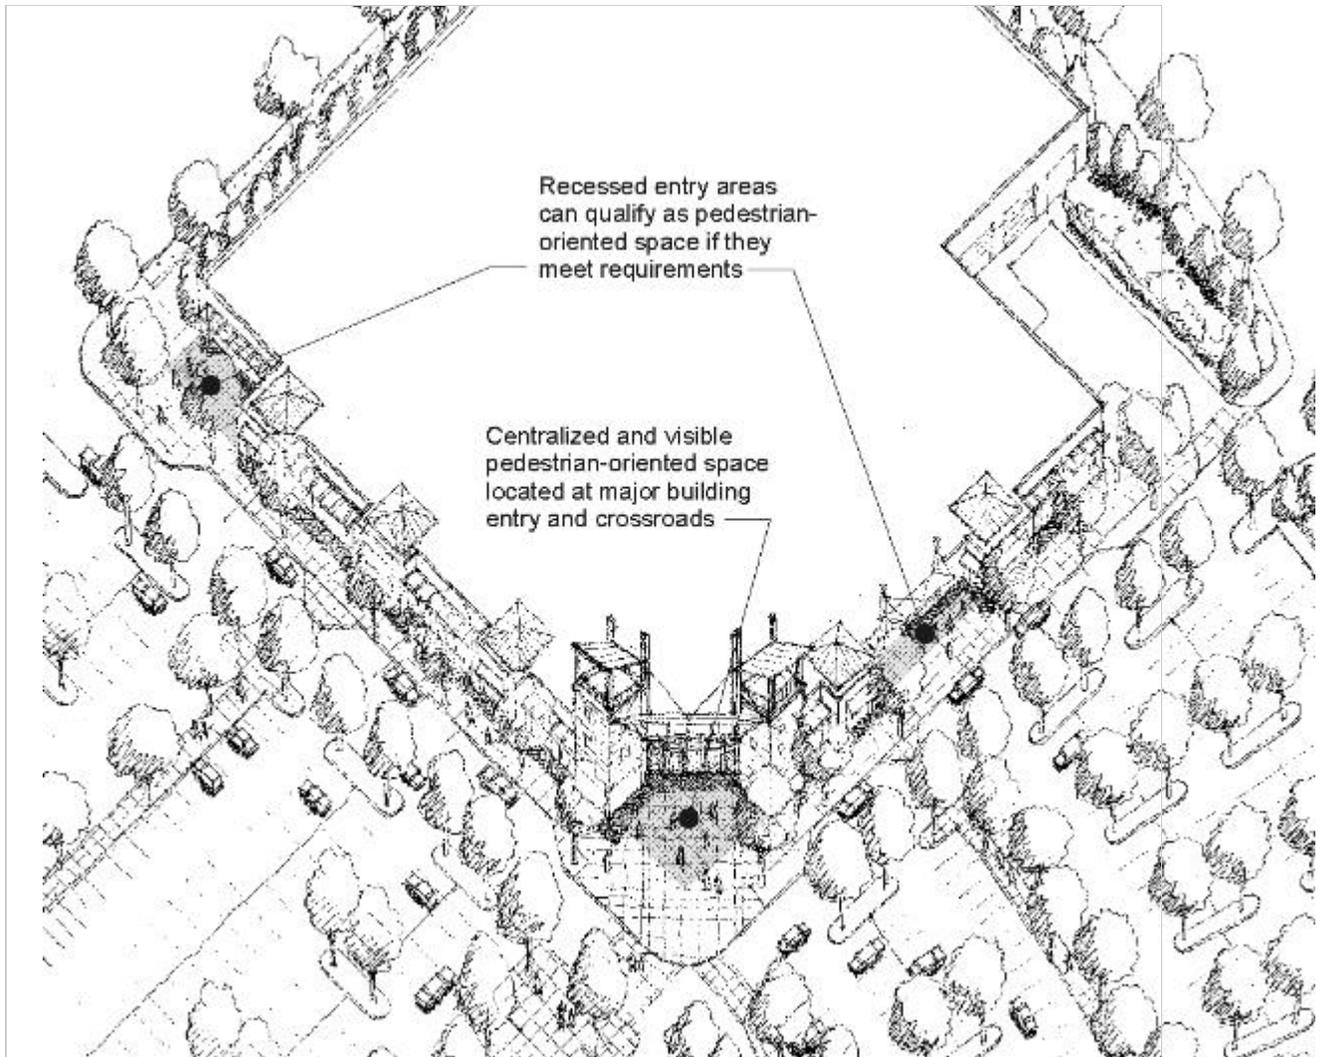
Examples of pedestrian-oriented space associated with a large scale retail building.
